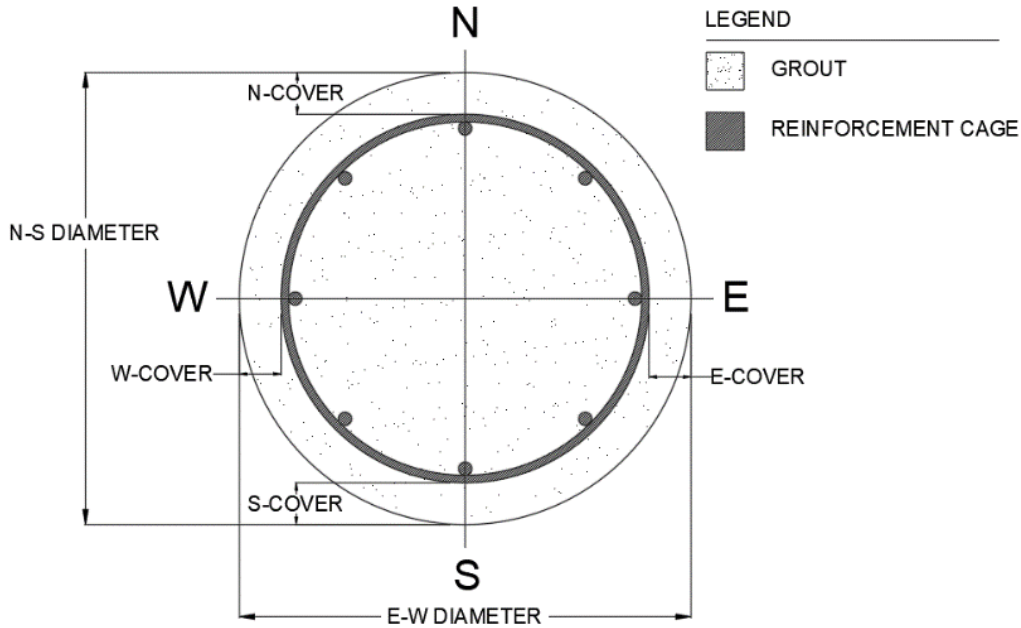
Diagram of all as-built measurements taken at pile cut-off elevation (Mee, 2022)
